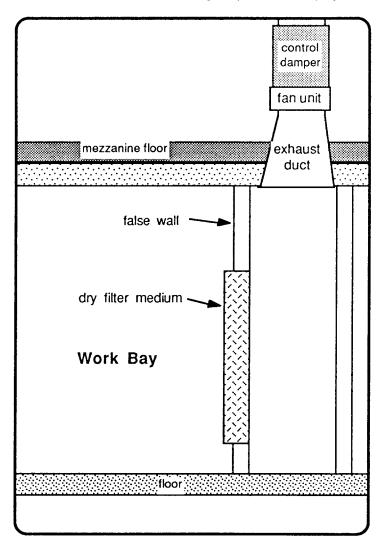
B.1 WORK BAY WALL COLLECTOR
